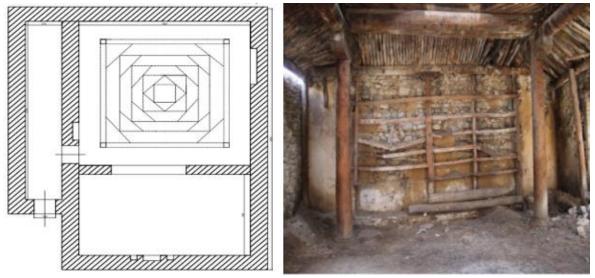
Erzincan-Çayırlı-Başköy Dursun Koçgil's Village Room, Left: Plan of the Room, Right: Interior of the Room (Naldan, 2020, pp. 249-263).
